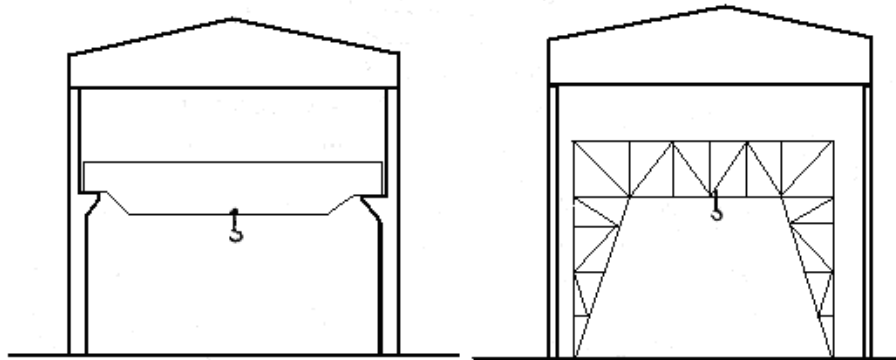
Reducing seismic impact by replacing overhead cranes with floor cranes.
